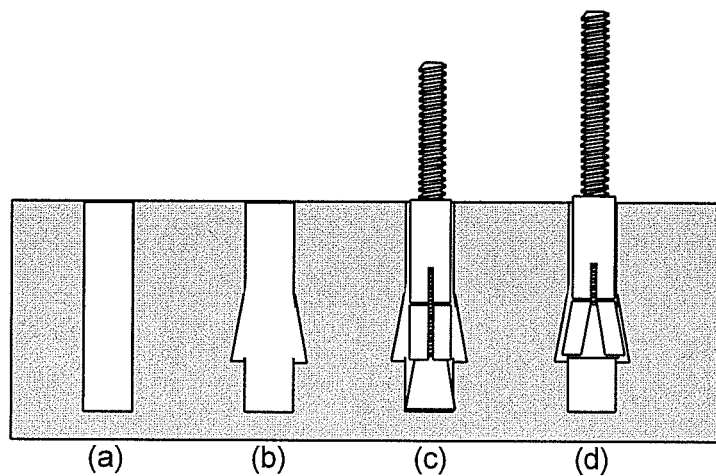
Illustration of Installation of One Type of Undercut Anchor: (a) drilled hole; (b) drilled undercut; (c) anchor inserted inside hole; (d) undercut anchor after expansion [Rodriguez 1995]
